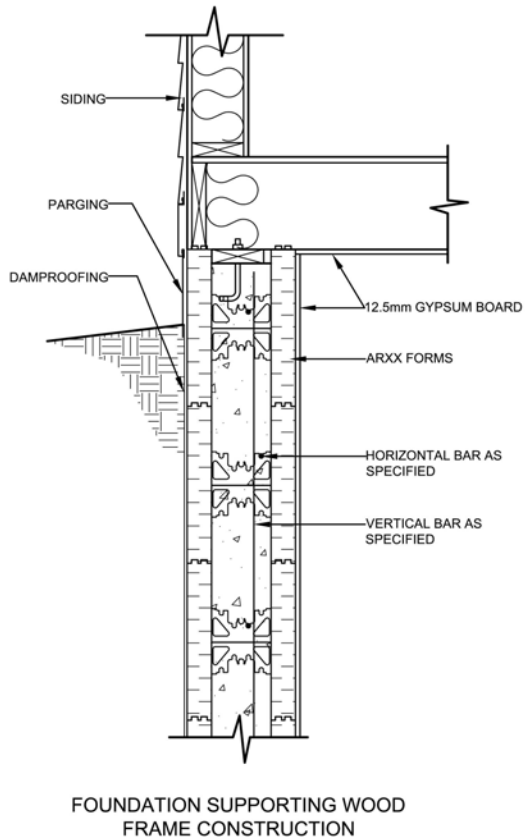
Section of "Arxx High Performance Wallsystems" supporting siding
